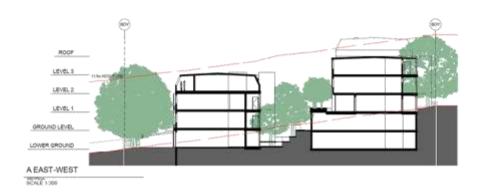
East-West Site Section (as submitted with Planning Proposal (Urbanlink plans p.15)
